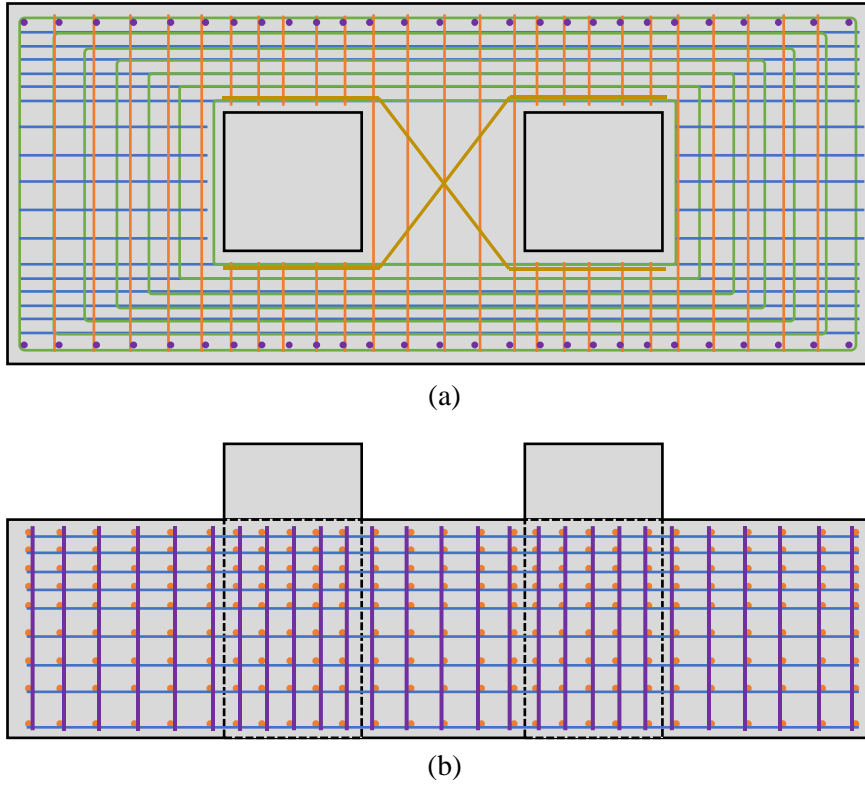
Schematic of pile cap reinforcement scheme used by Issa [13] (a) plan and (b) elevation views
